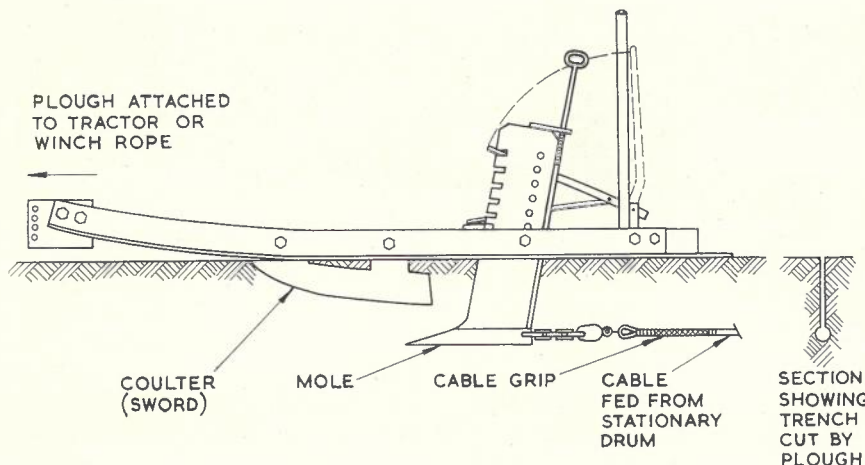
Agricultural Plough Adapted to Lay Cable.
